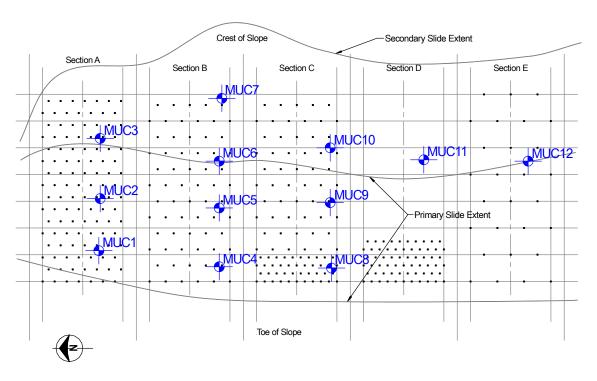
Plan view of US54-Fulton site showing approximate boring locations.
